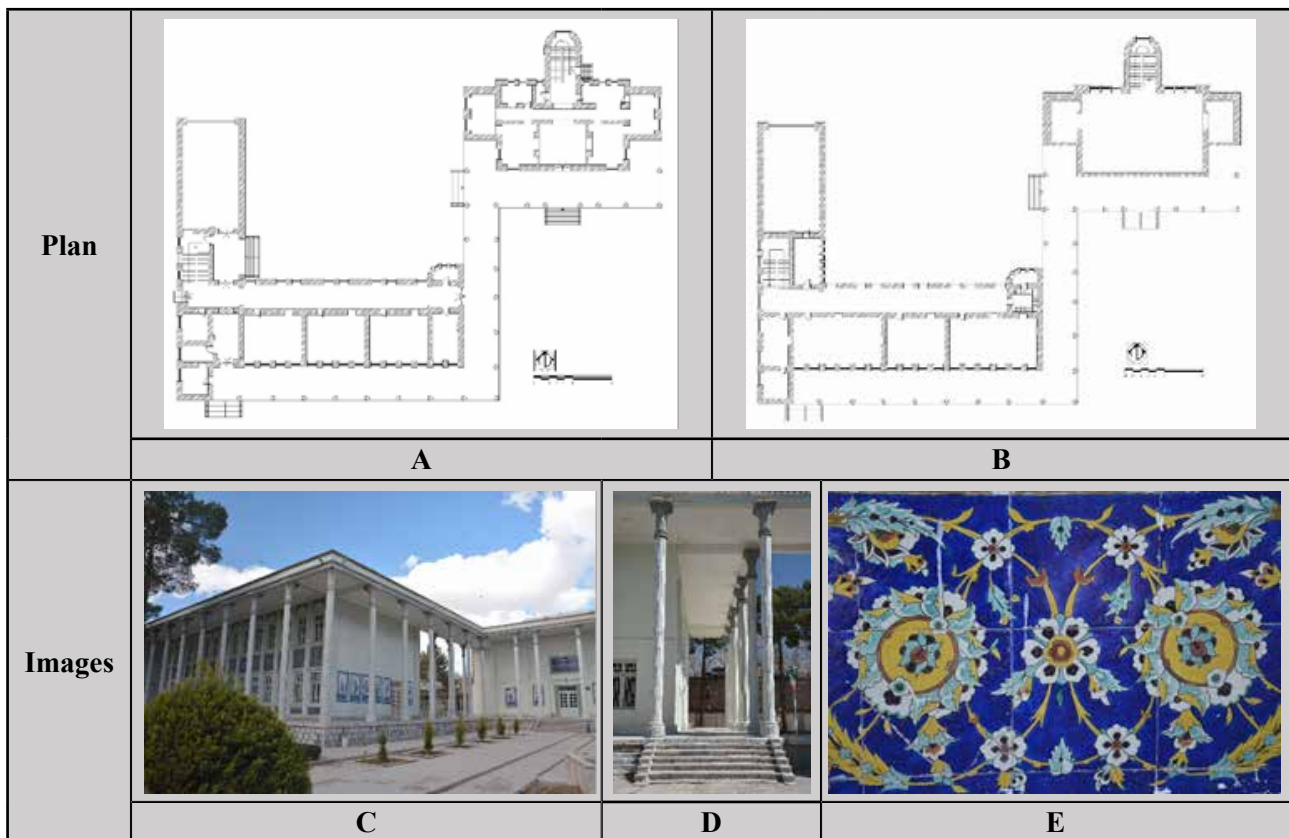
Fine Arts Conservatory: A- Ground floor plan; B- First floor plan (Mapping: Authors); C- South view of School; D- Columned Iwan; E- Tile decorations. Photos: M. Karahmadi.
